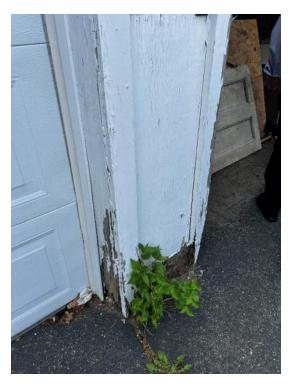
IMG_1012 Addition - Exterior wall finish deterioration
